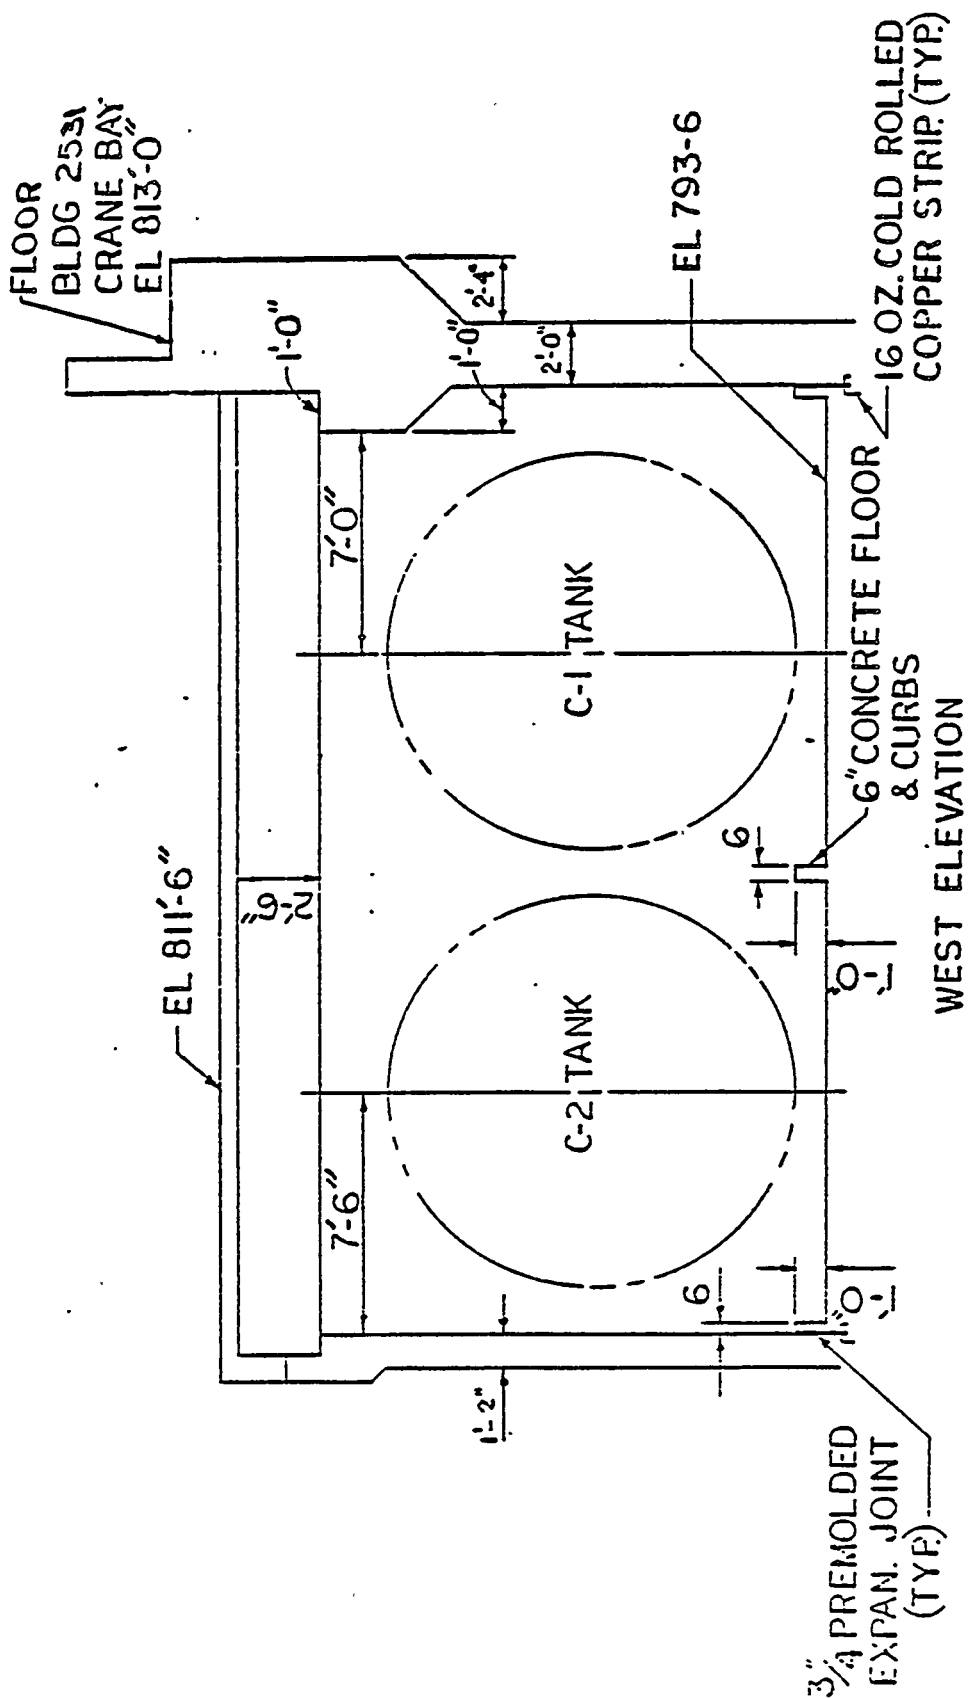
HLW STORAGE TANK VAULT ELEVATION (Binford and Orfi, 1978)
